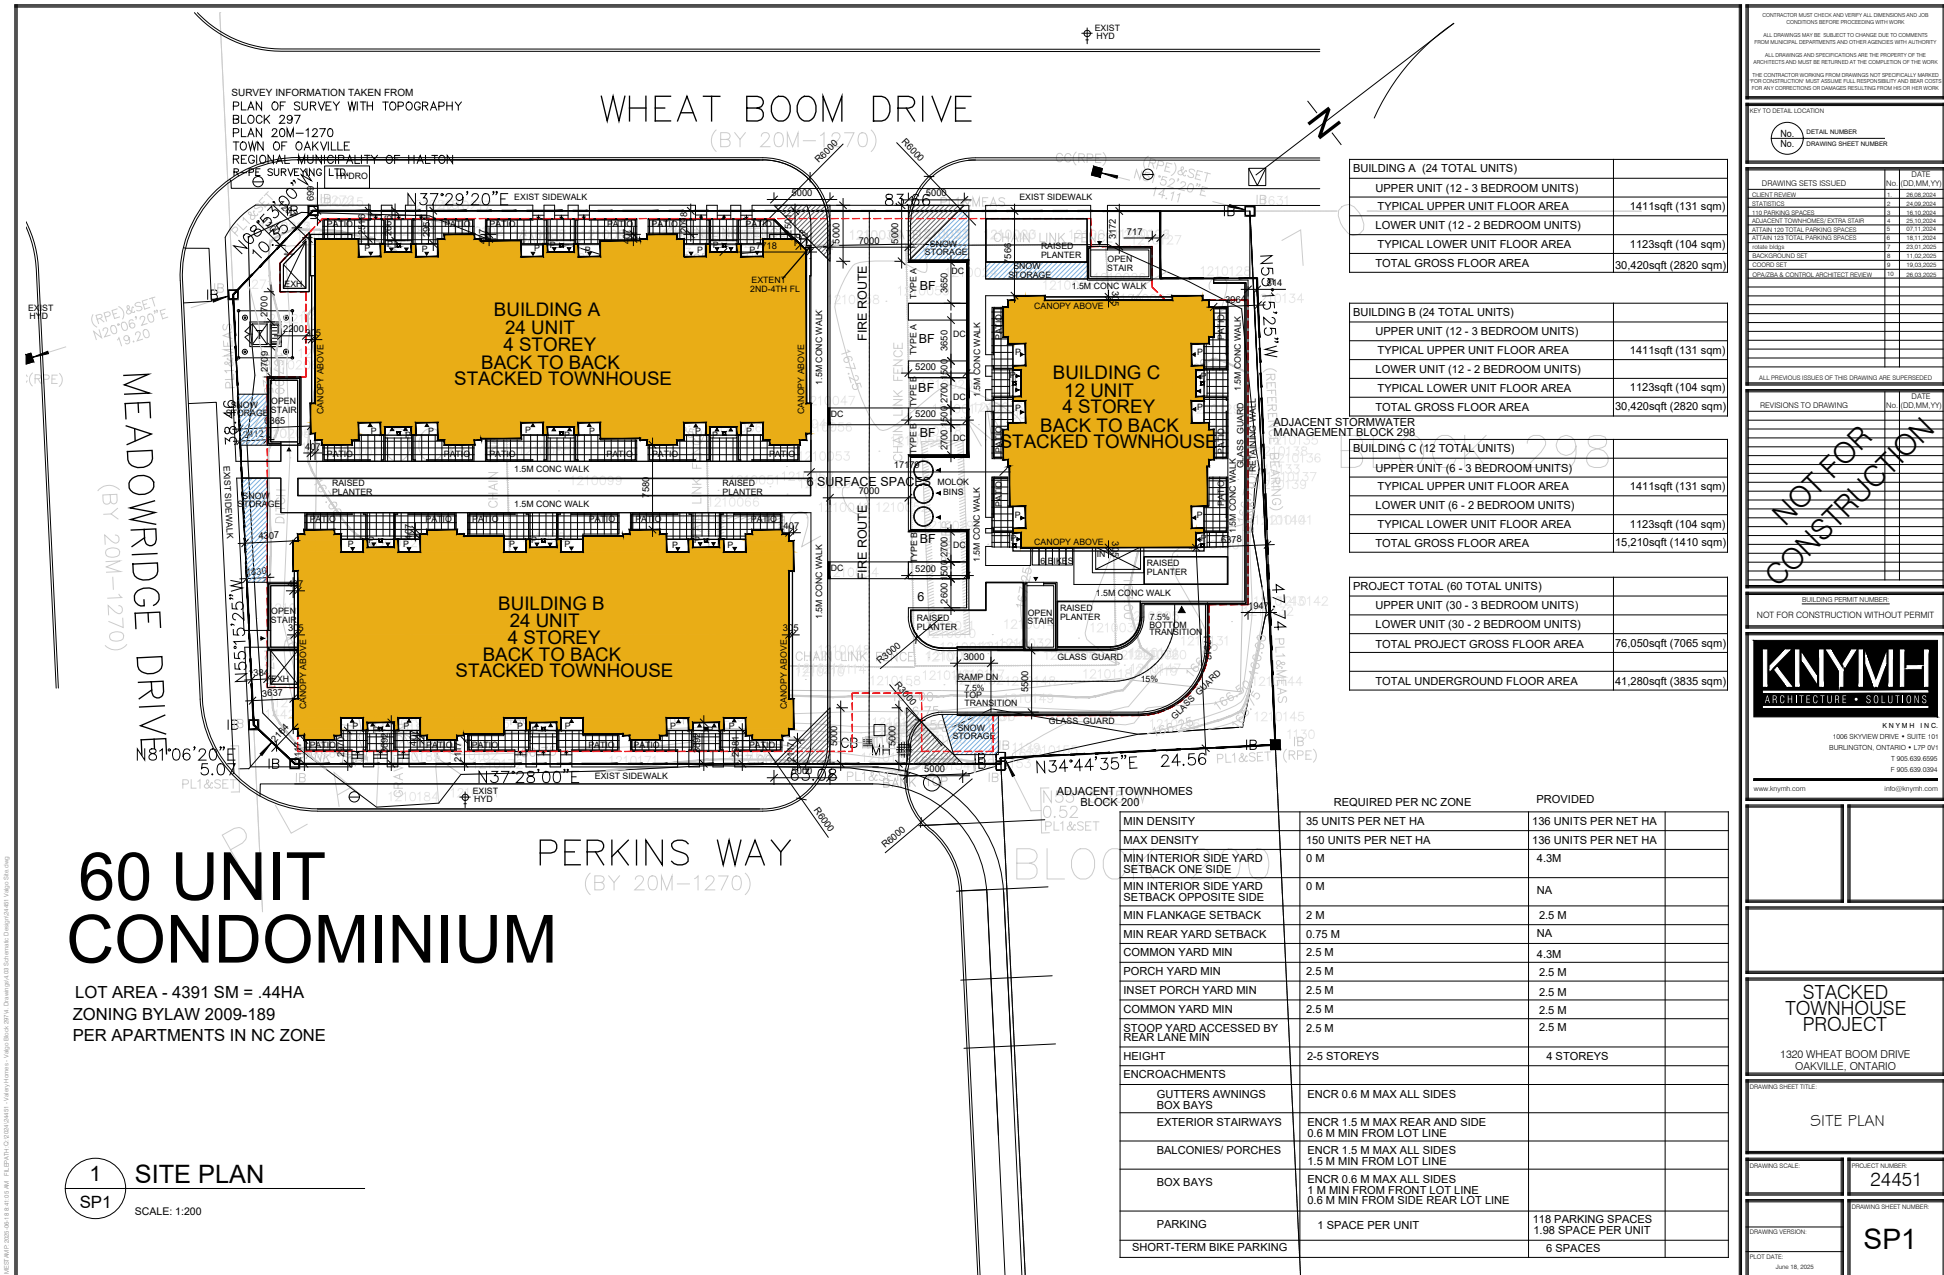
Joshua Creek 1320 Wheat Boom Drive Site Plan
